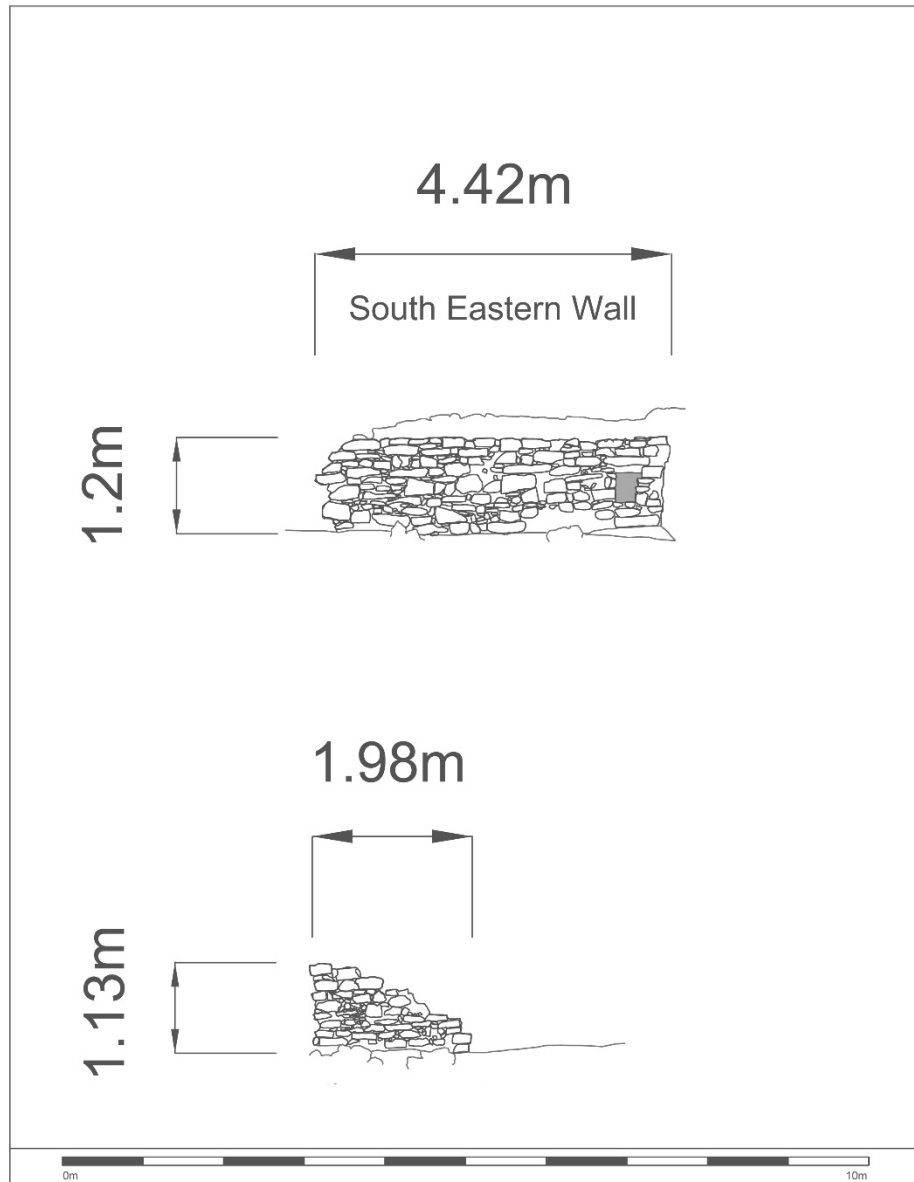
Internal elevations of the south-east (top) and north-east (bottom) walls of the collapsed or unfinished signal tower at Lenadoon Point Signal Station. The chute passing through the south-west part of the south-east wall is shaded grey.
